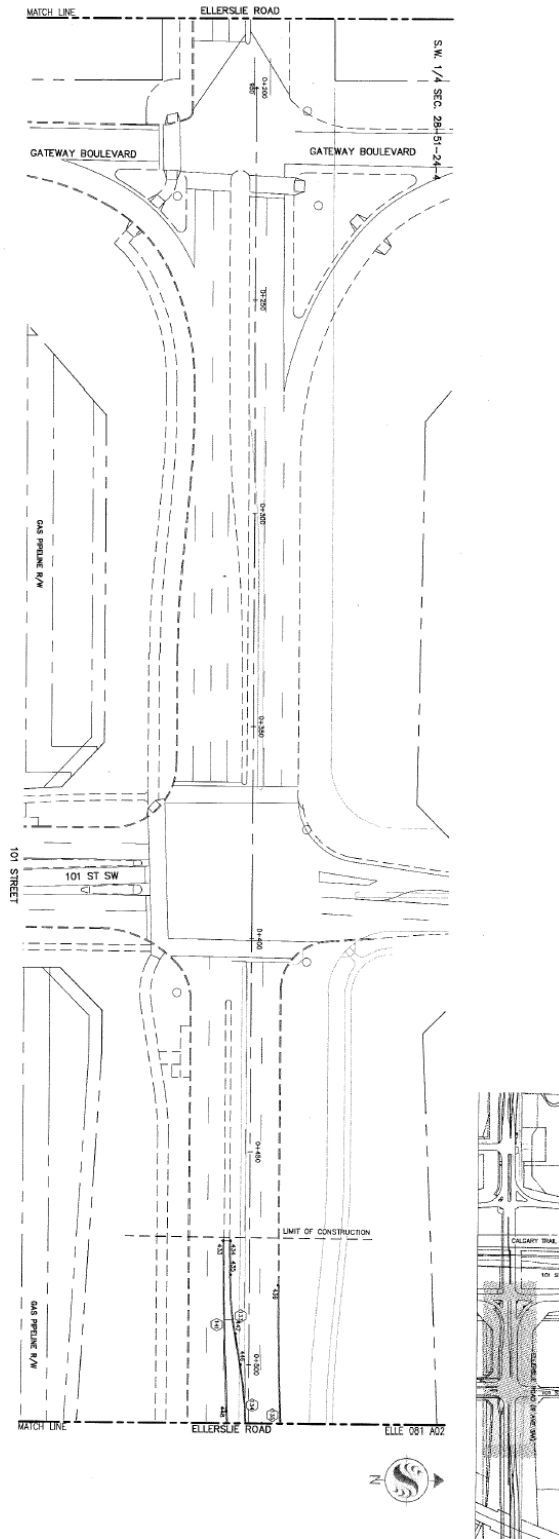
Ellerslie Road Gateway Blvd Site Plan
